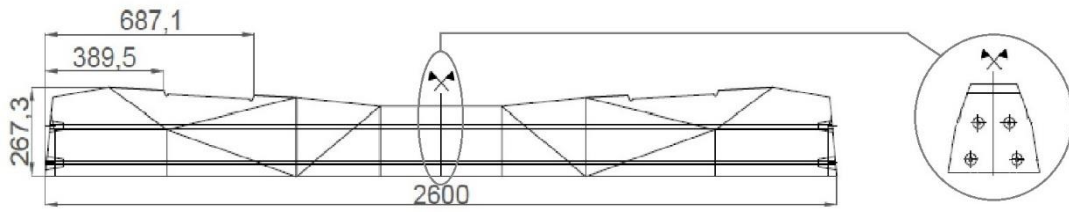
Schematics of a prestressed sleeper from side view and section view (unit: mm).
